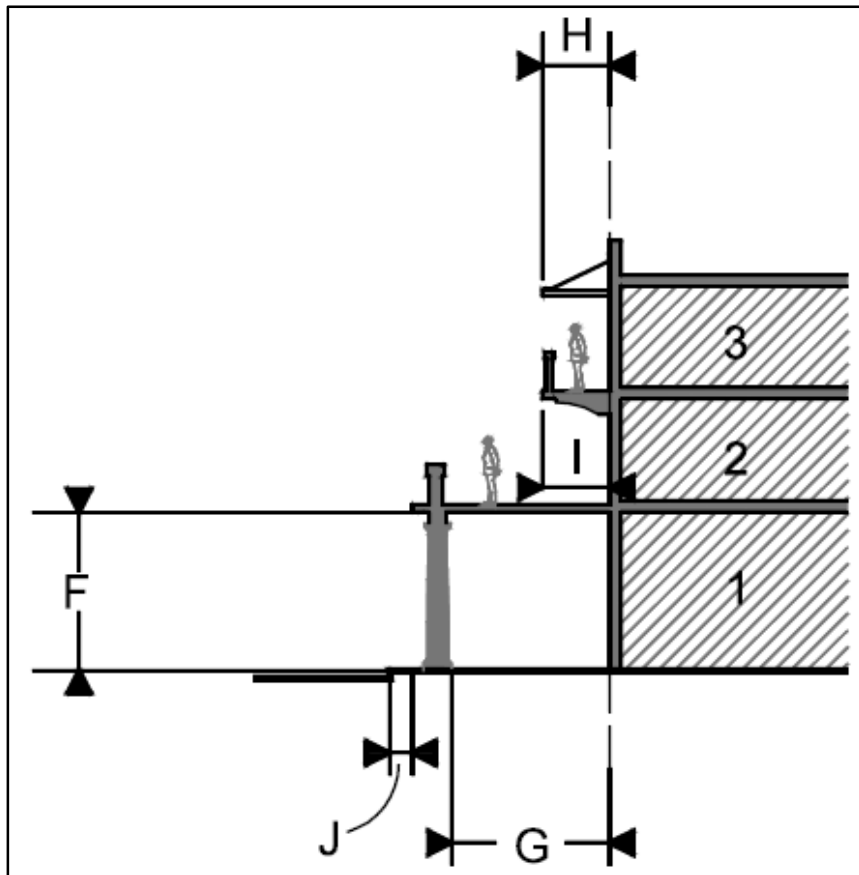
A Development Standards in Districts 1, 2 and 3 (Jensen Beach Blvd., Ricou Terrace and Pineapple Ave. North Zoning District Overlays)
